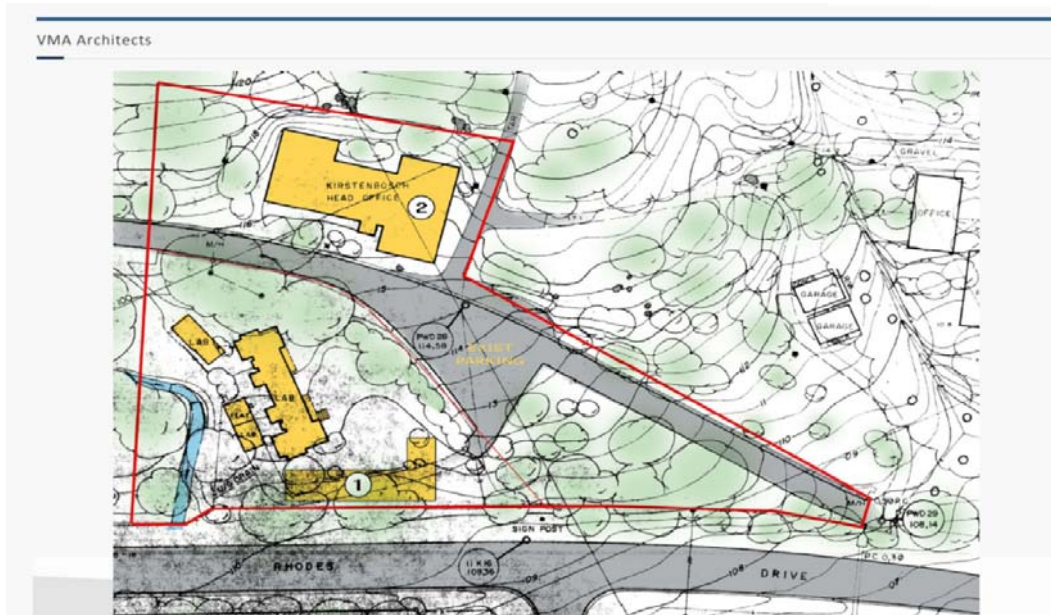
Site Plan of the location of the new proposed Administration Building (2) and Fynbos Lodge et al at the Kirstenbosch NBG
